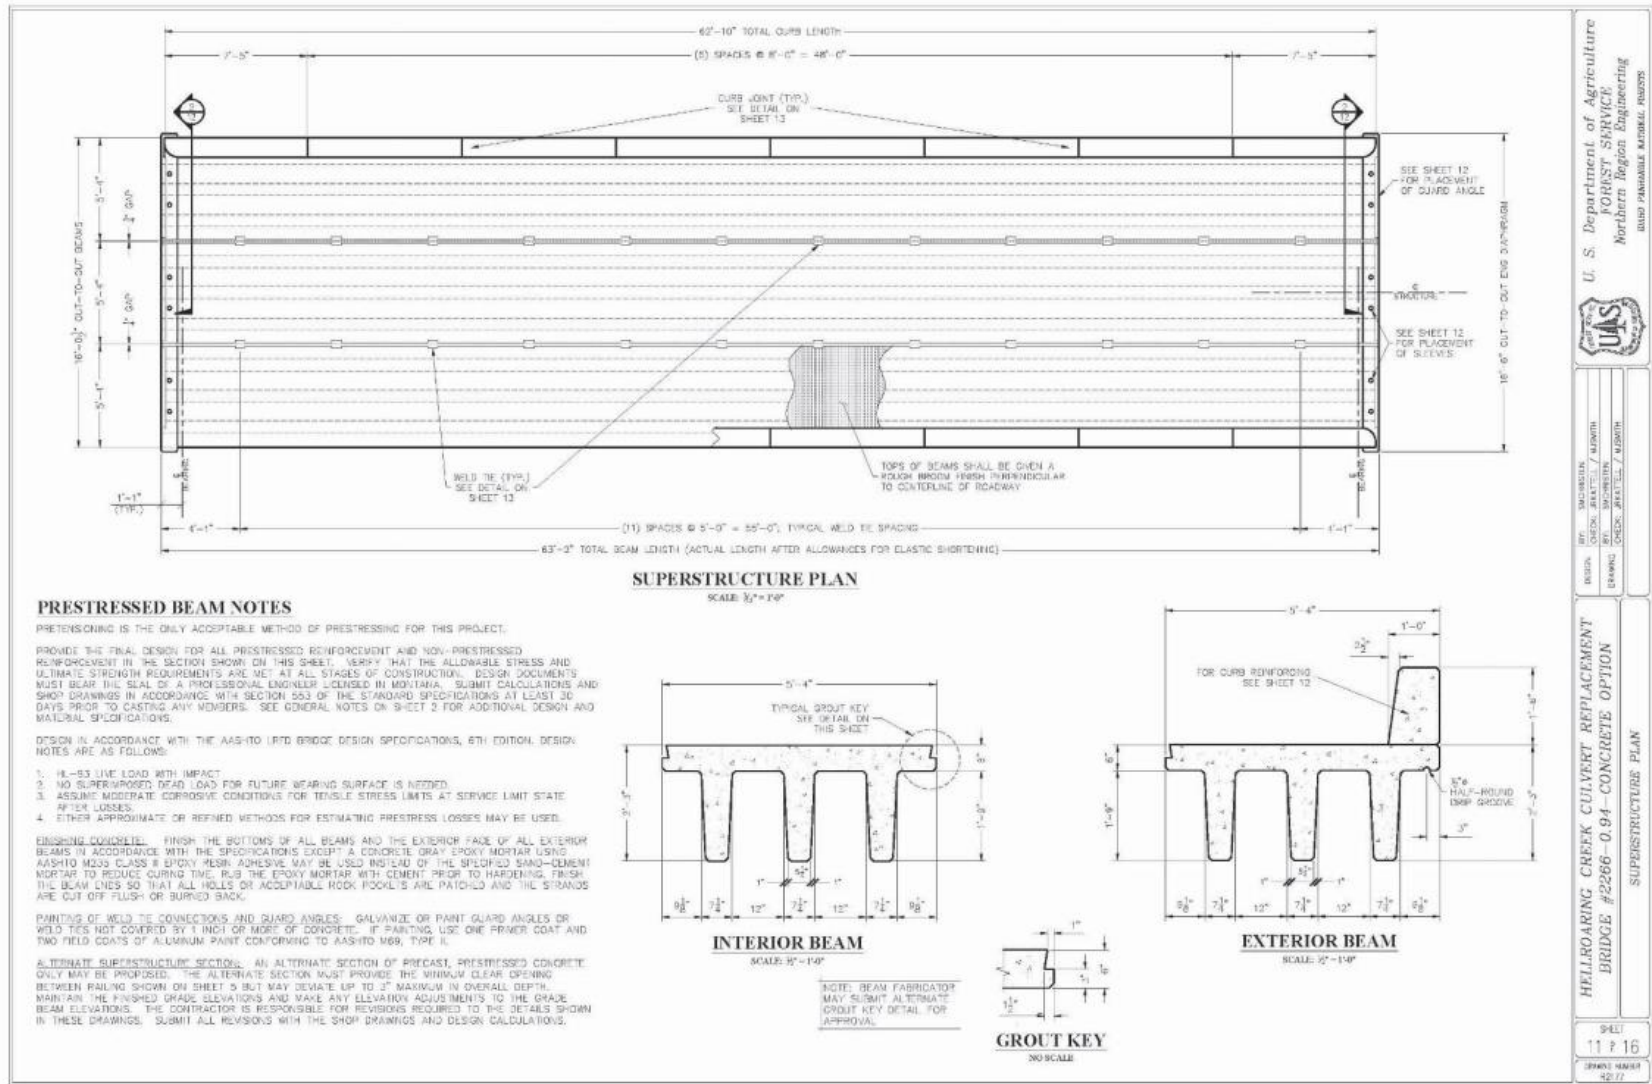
Hellroaring Creek Culvert Replacement Design Plans [8]
